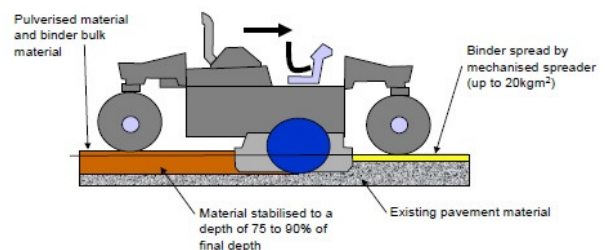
The reclaimer mixes the cementitious binder and existing pavement material with no water during the first stage mixing.
